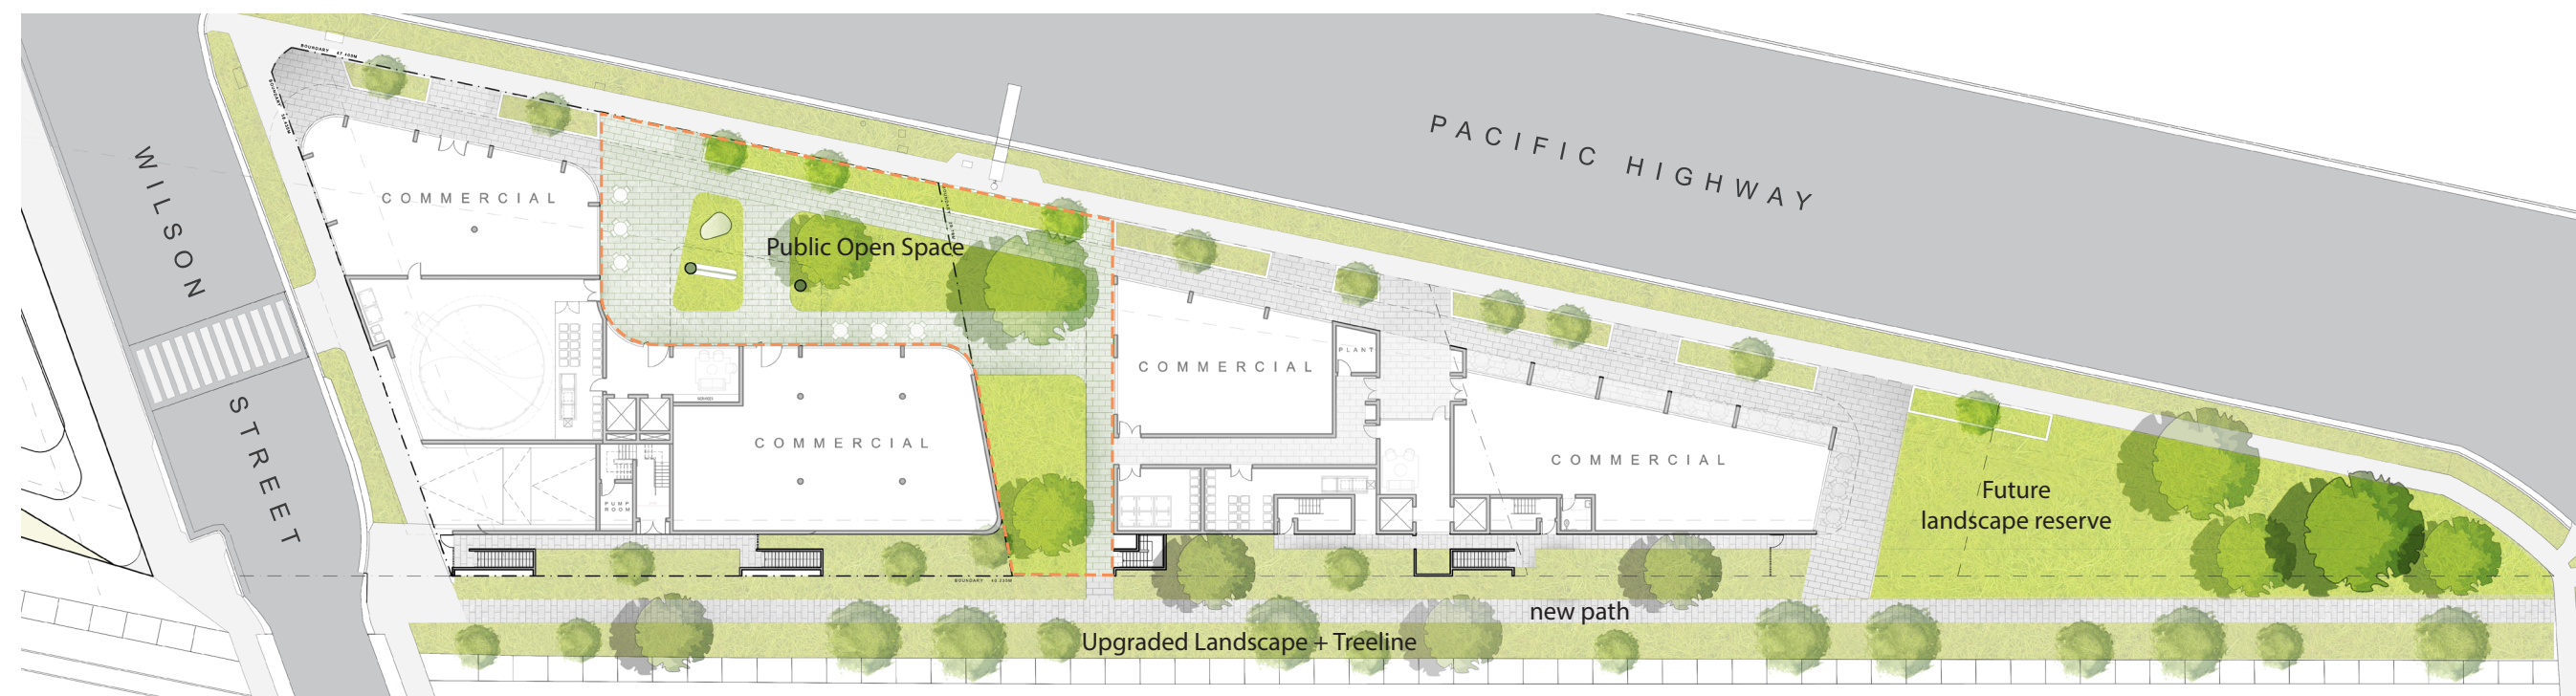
Concept Landscape Plan for subject site and potential future development of Service Station Site
